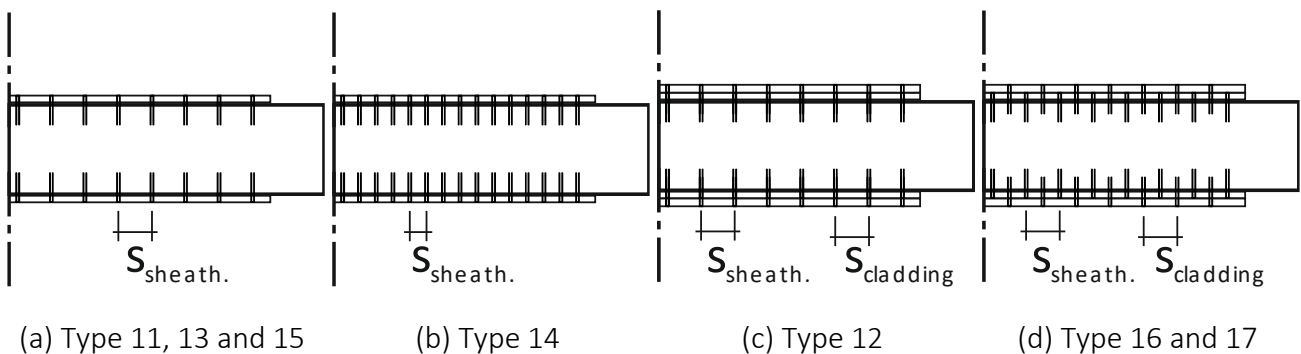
Fastener details in the top rail of the test specimens with double-sided sheathing.
